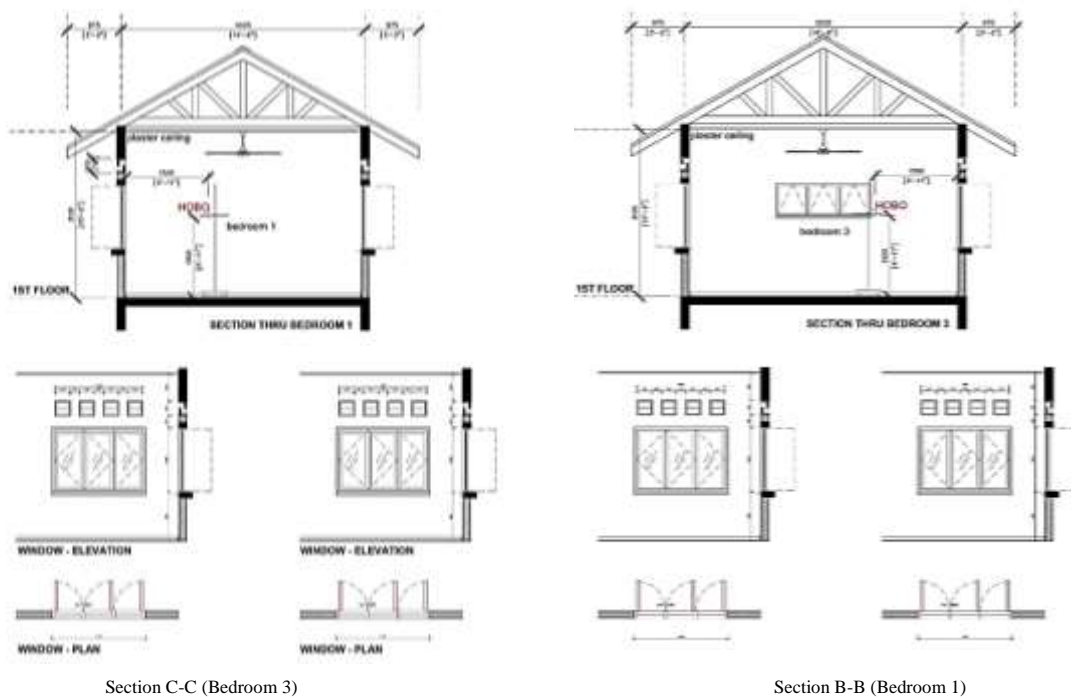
Monitoring equipment setup in bedrooms 1 and 3 (Sections B-B & C-C) on the first floor and ventilation block design. (Source: Authors)
